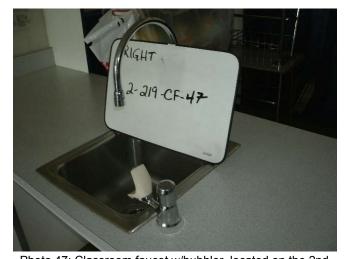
Classroom faucet w/bubbler, located on the 2nd floor, in room 219.
